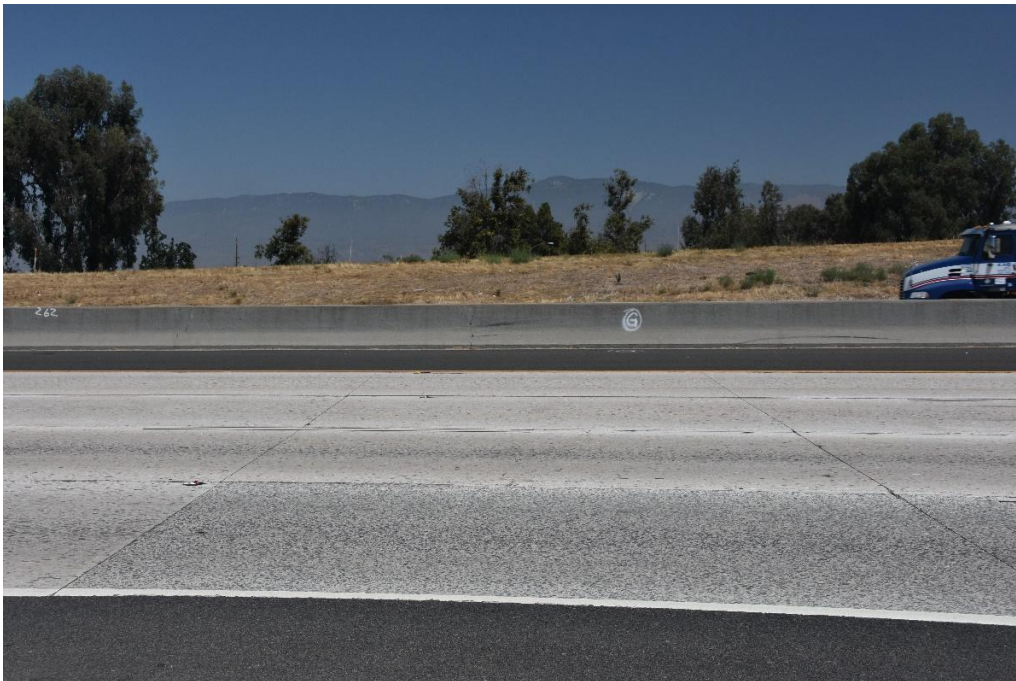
Highway I-10 EB direction (PM 76-88), near San Bernardino showing another 14-year old “Individual RSC” slab in Lane #4 (outer lane) with long joint spacing.
